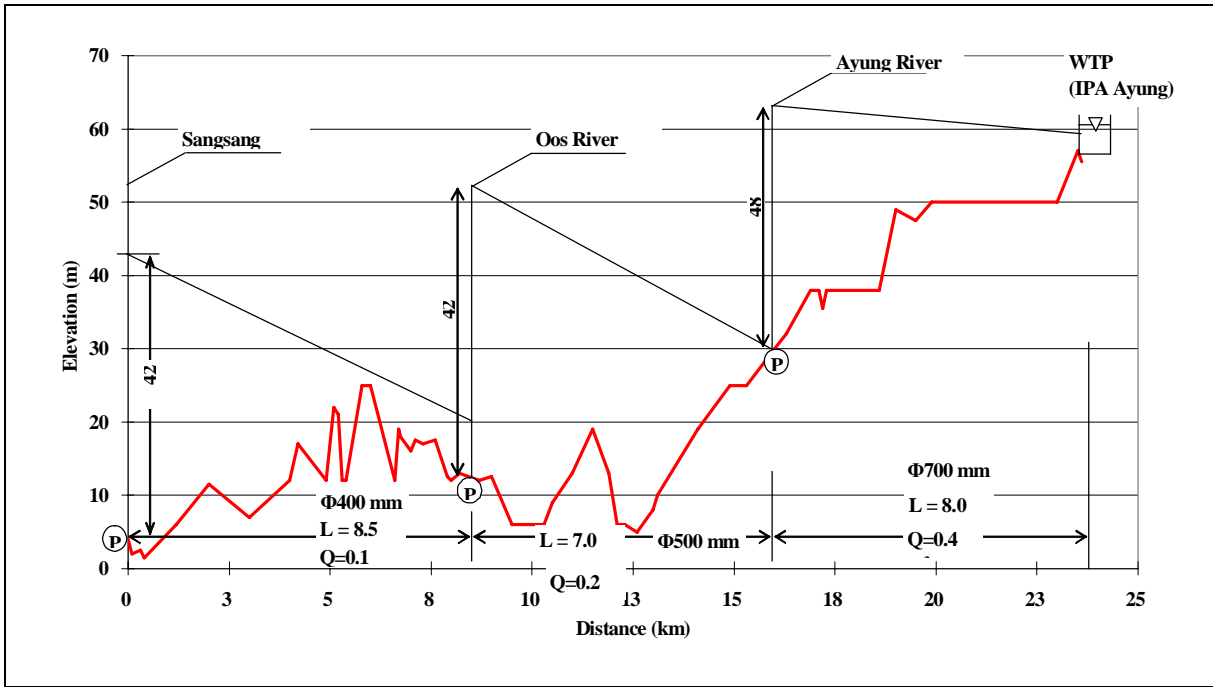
Longitudinal Section and hydraulic Gradient Line of Alternative C3&C5
